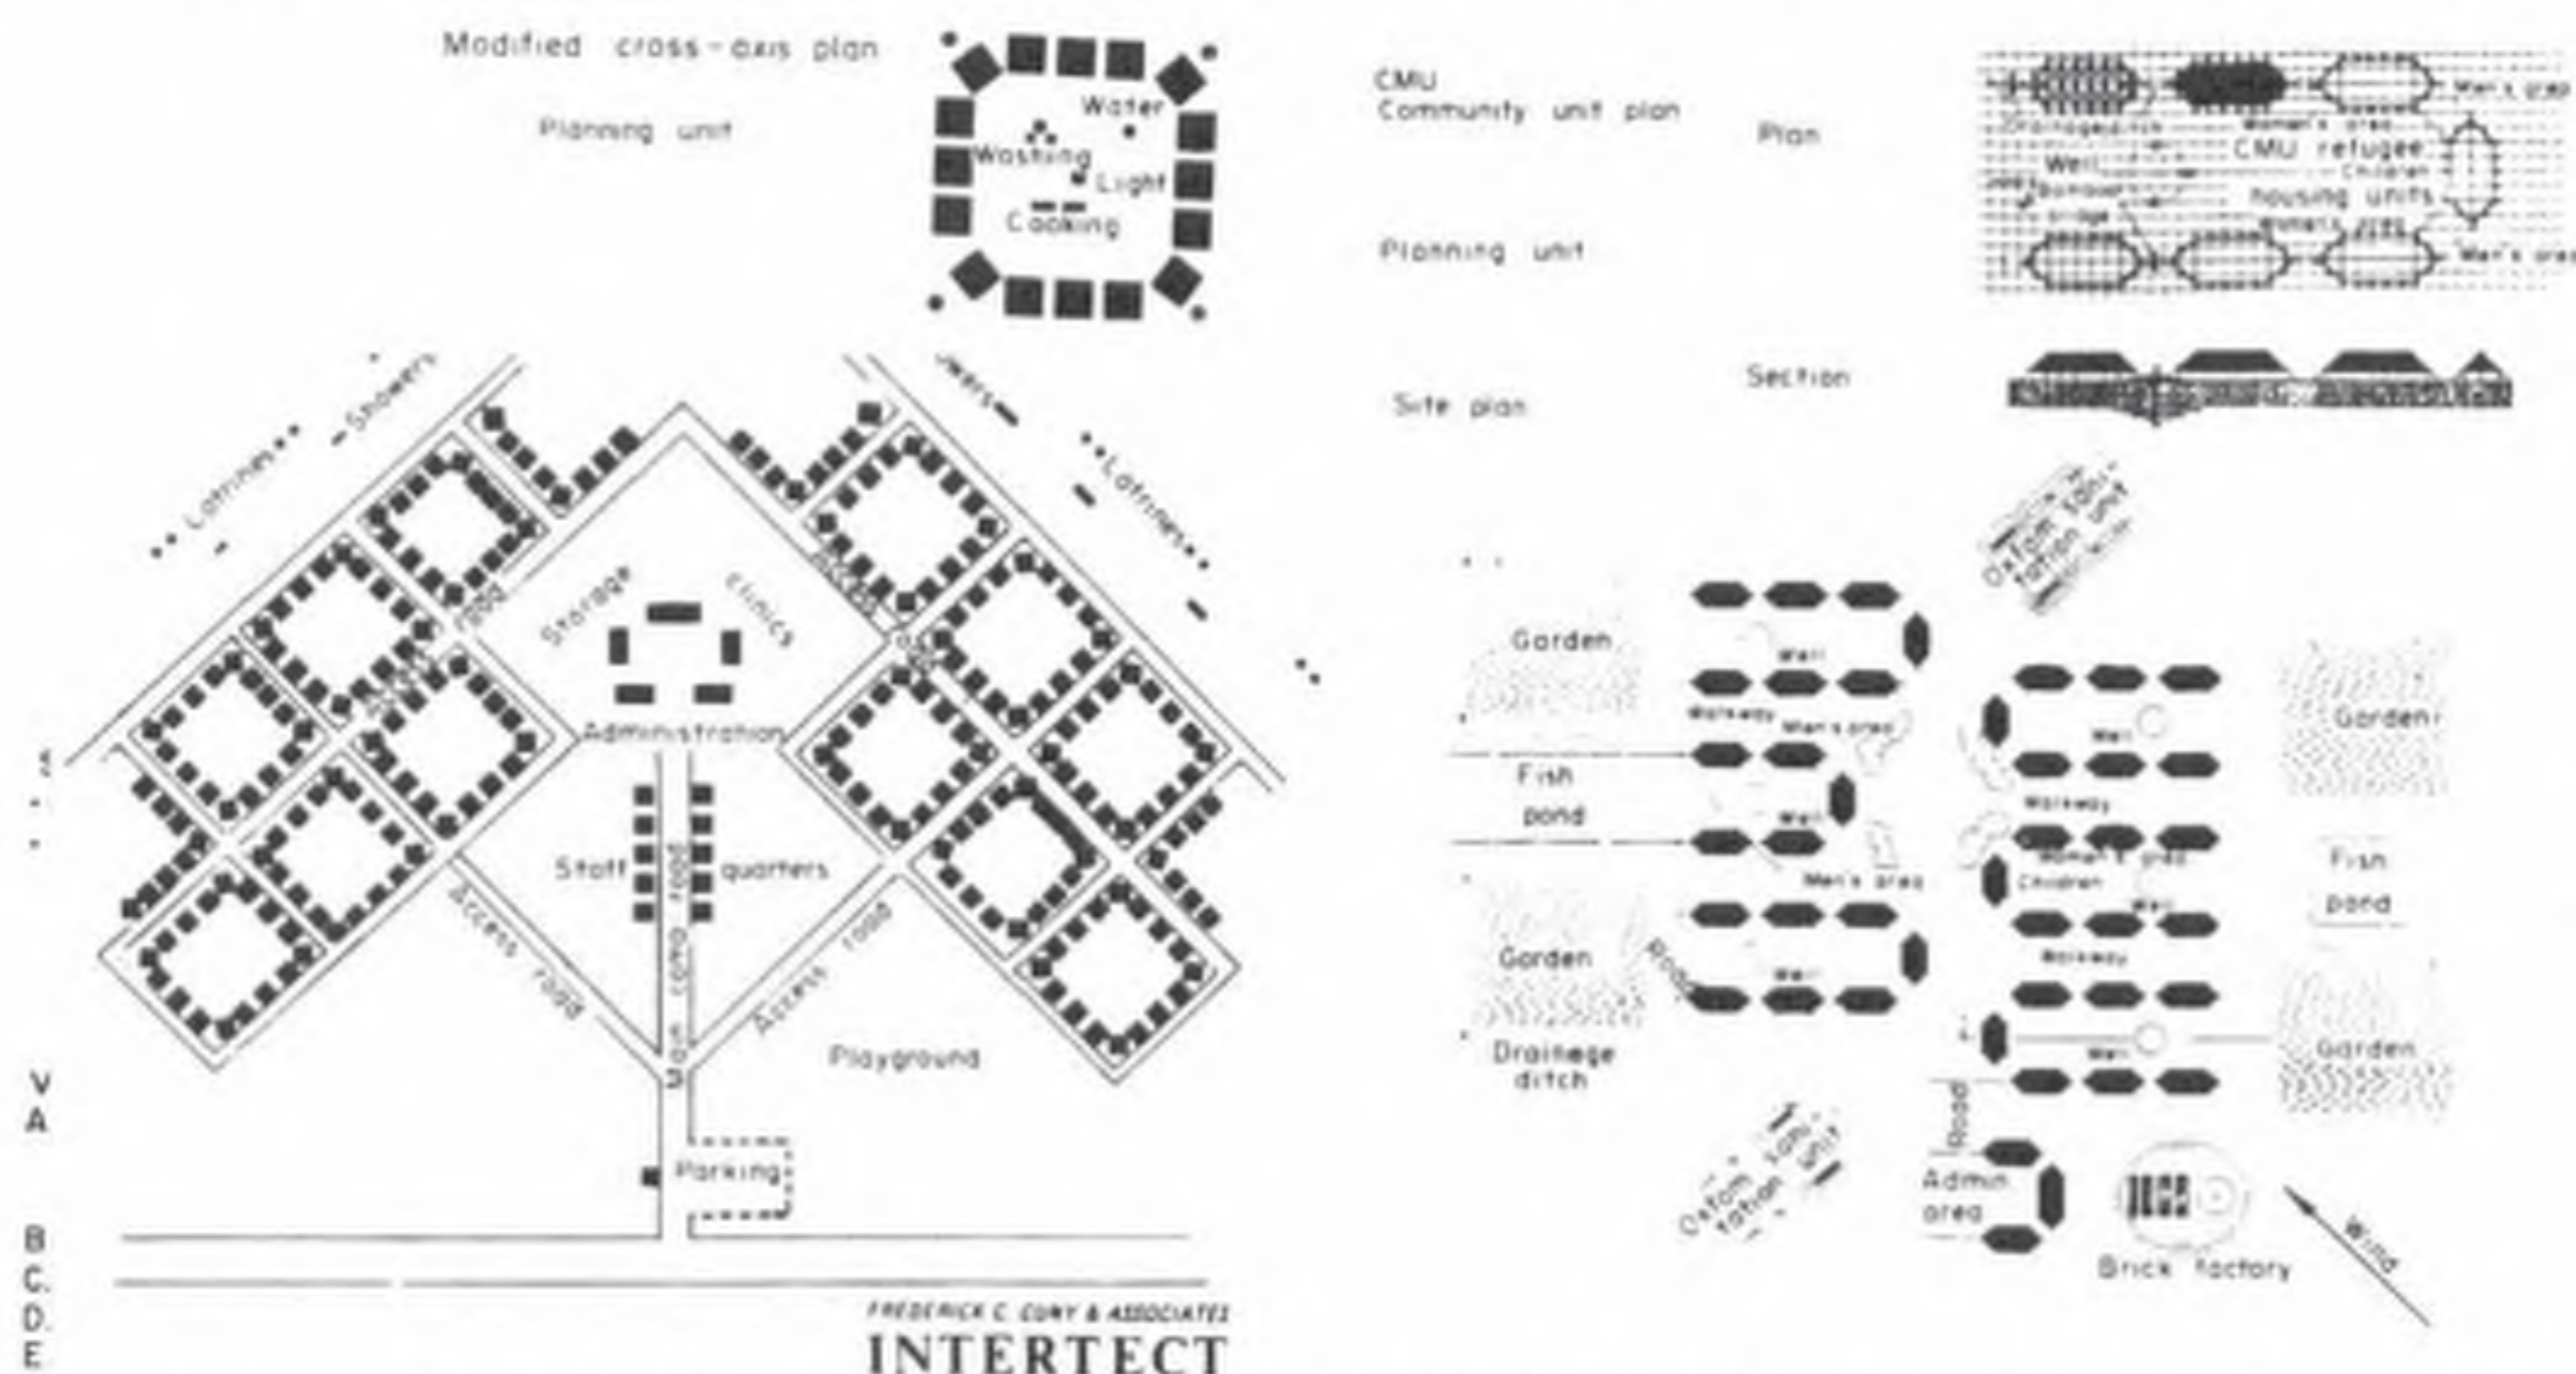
Modified Cross-Axis Plan (left) and CMU Plan (right). Source: Cuny 1977
